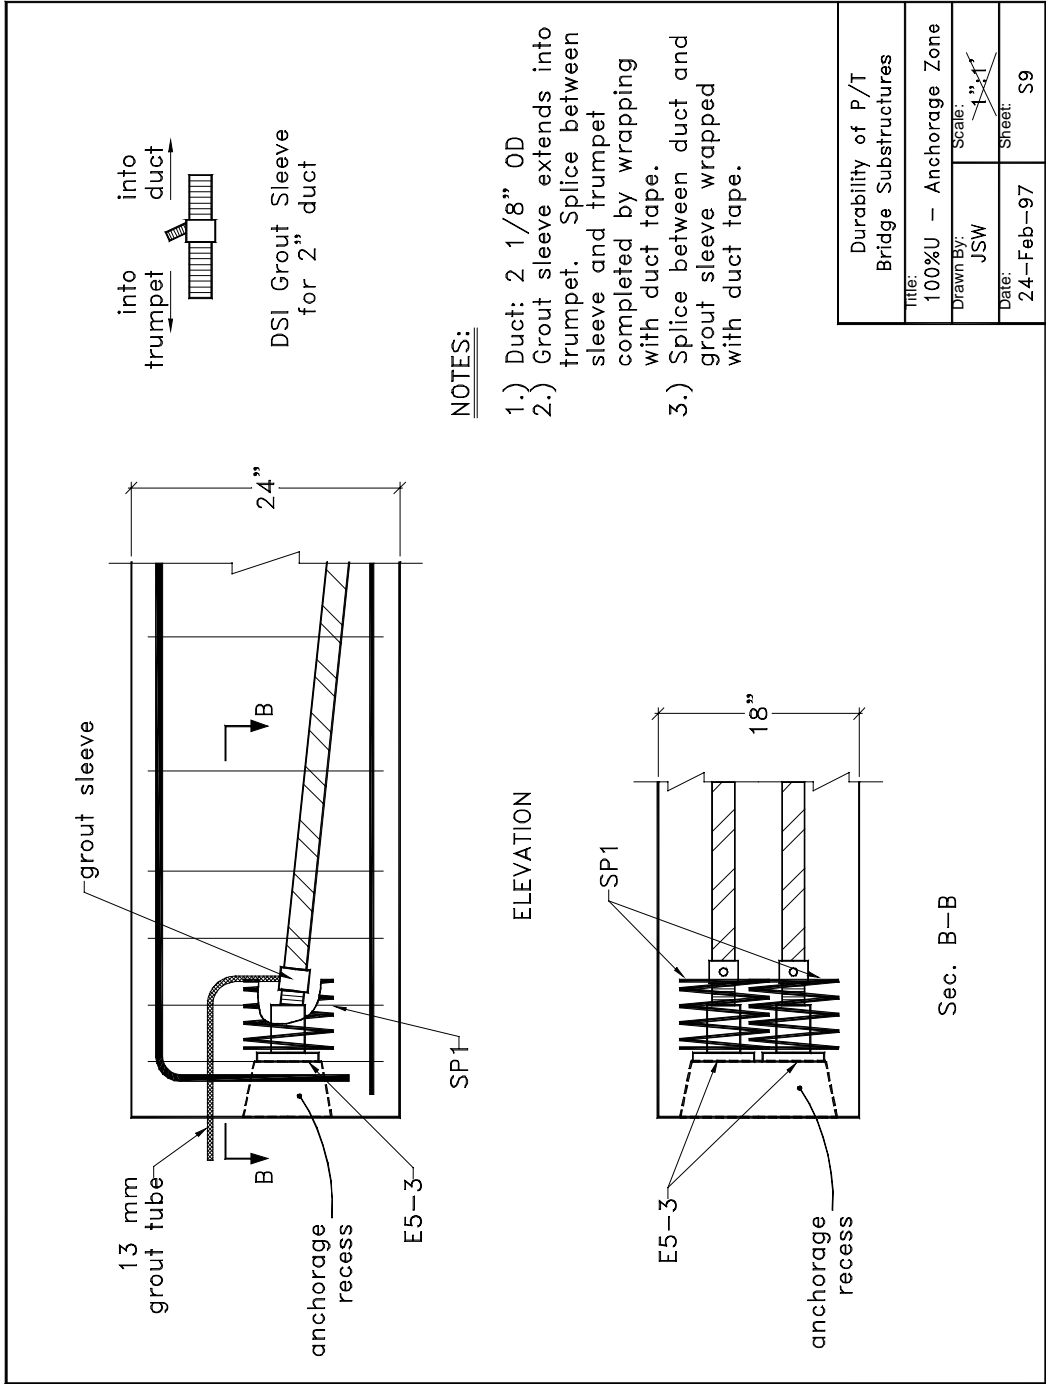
Sheet S9: 100%U Anchorage Zone
